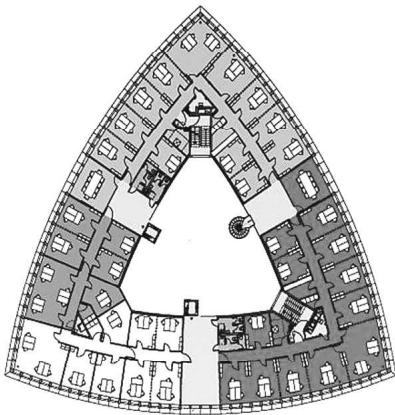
Passive office building, executed in 2002 in Ulm as the greatest passive building in the world. Drawing by author based on original drawing.
